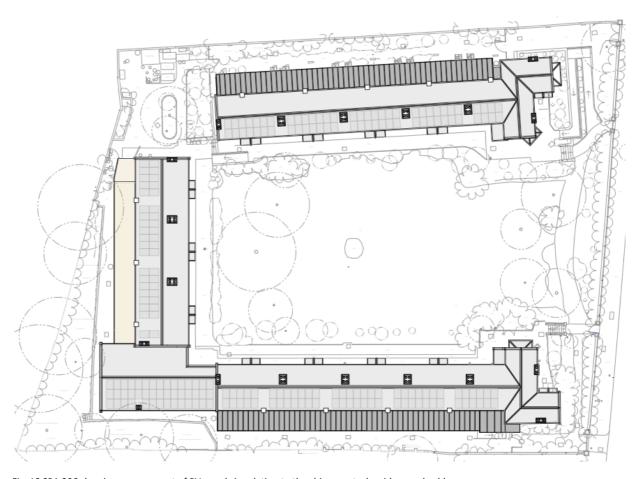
SPA 306 showing arrangement of PV panels in relation to the chimney stacks, ridges and gables.
